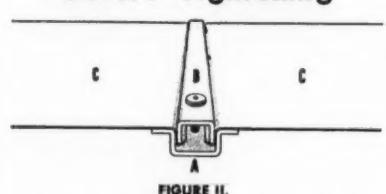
The four basic elements in place before the union is tightened. The edges of the panel sheets have been placed in position in the flanged frame (A). The tensioner (B) has been applied over the edges of the sheet. The socket lock screw has not yet been screwed down.
